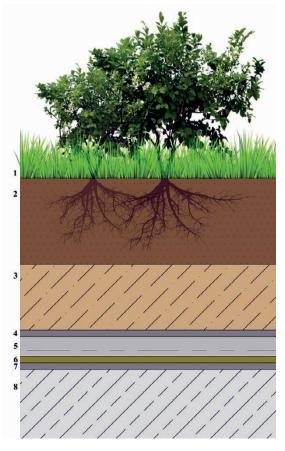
The cross section through the designed roof. Layer: 1 – vegetation; 2 – intensive substrate; 3 – substrate; 4 – filter geotextile; 5 – bulk material; 6 – protective geotextile; 7 – waterproofing membrane; 8 – roof construction (by P. Krupiński)
